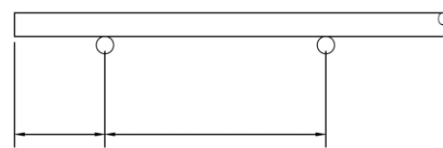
Pitch and Overhang for a Typical Steel Mesh
